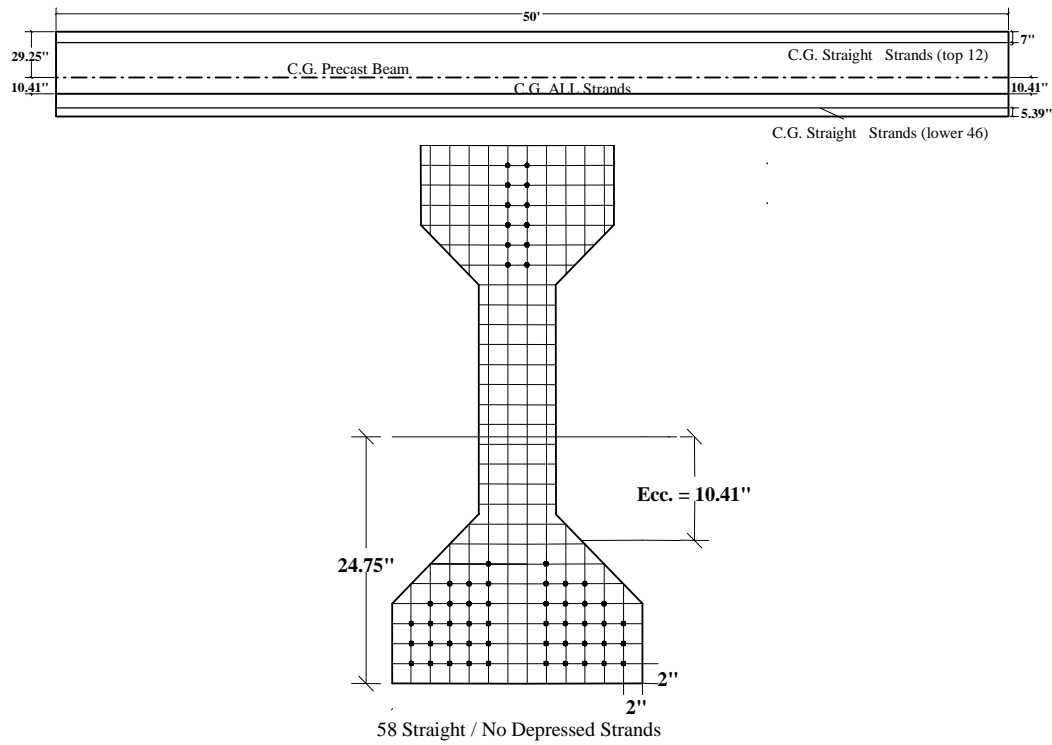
Elevation and Cross Section Views of the Exterior Girders, Slaughter Creek Bridge
